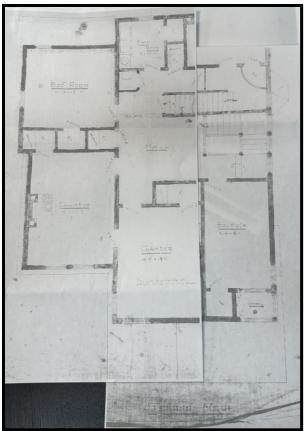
Scanned Copy of Original Second Floor Plan of 451 Niagara Boulevard (FEHM n.d.)
